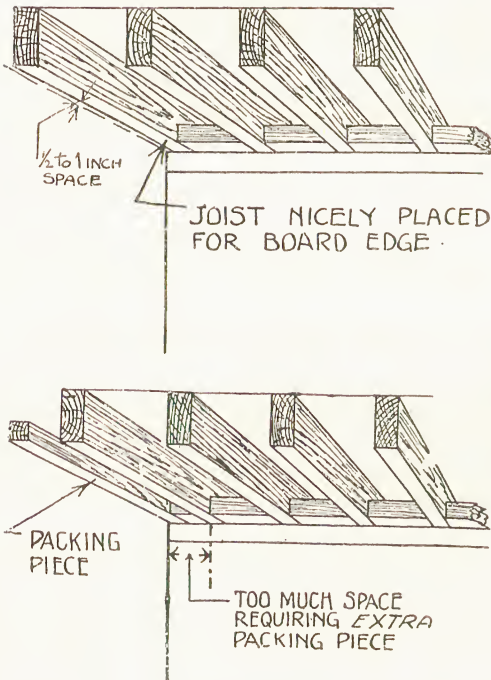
Details of fixing wall-board to ceilings and angles.
